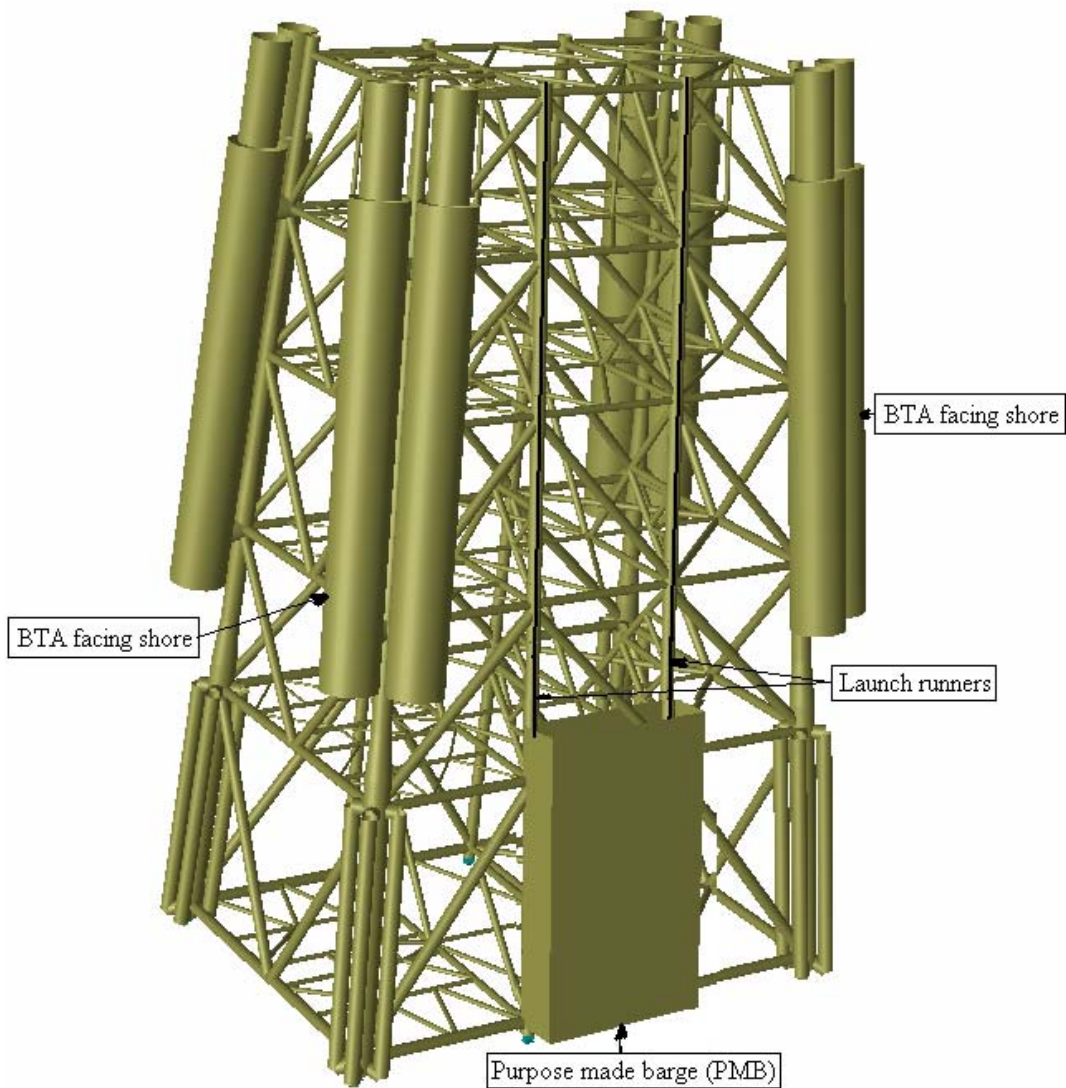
BTAs and the Purpose Made Barge (PMB) connected to jacket
